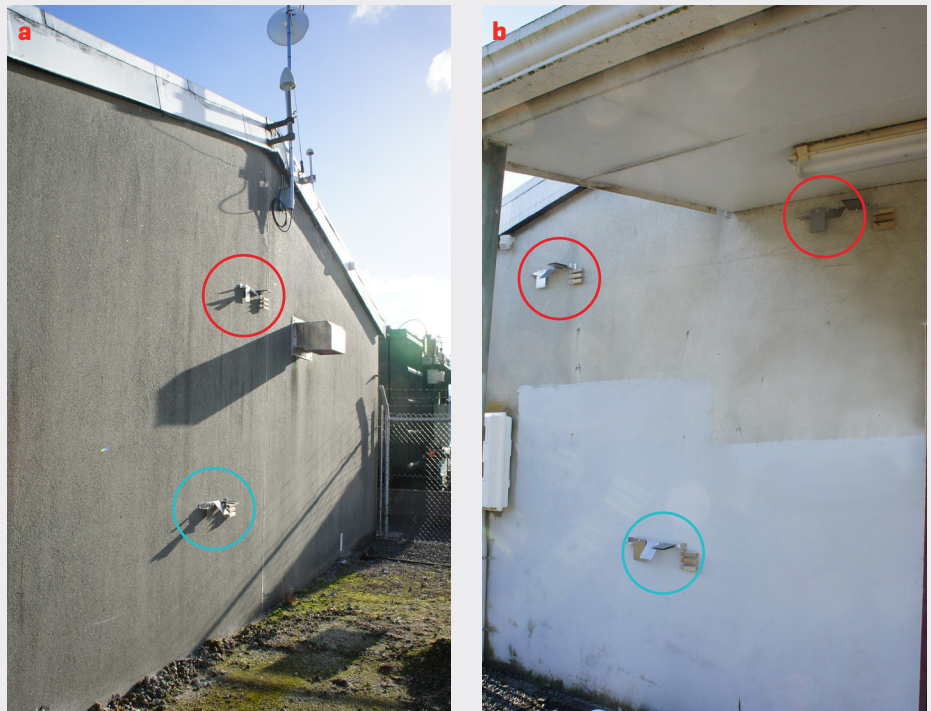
The monitoring positions on the Arawa substation building in Rotorua.
